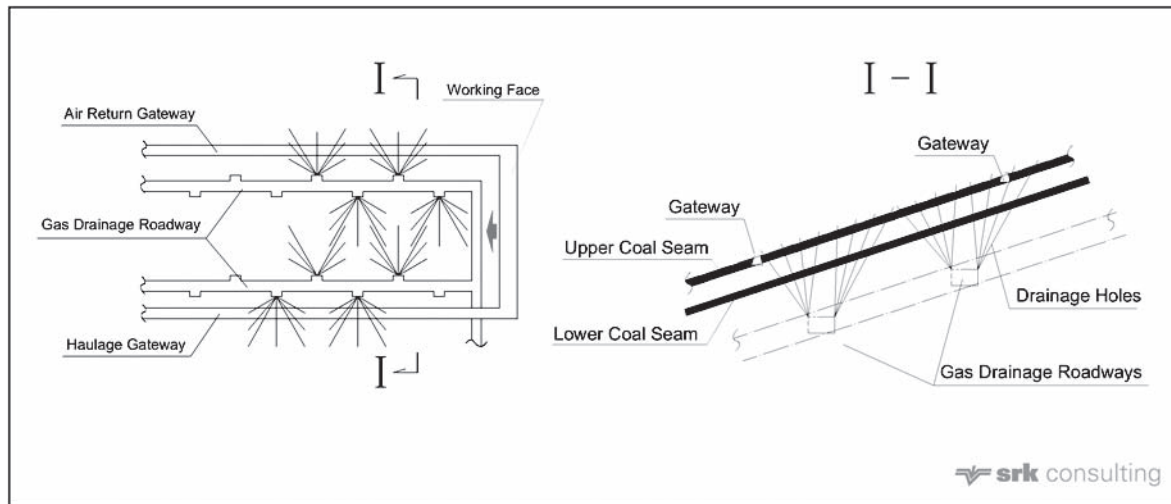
Schematic of Underground Coal Seam Gas Drainage System in Luozhou
